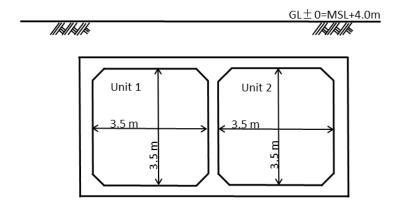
Section of a Standard Underground Discharge Tunnel
